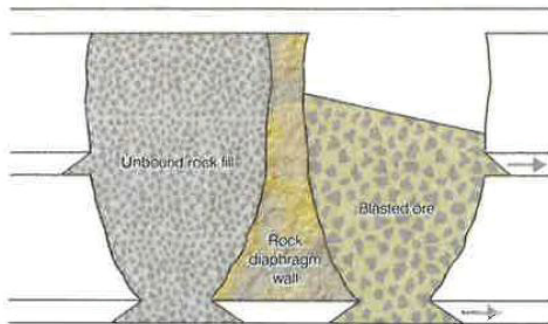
Rock diaphragm wall for rock fill support⁶ p.10
